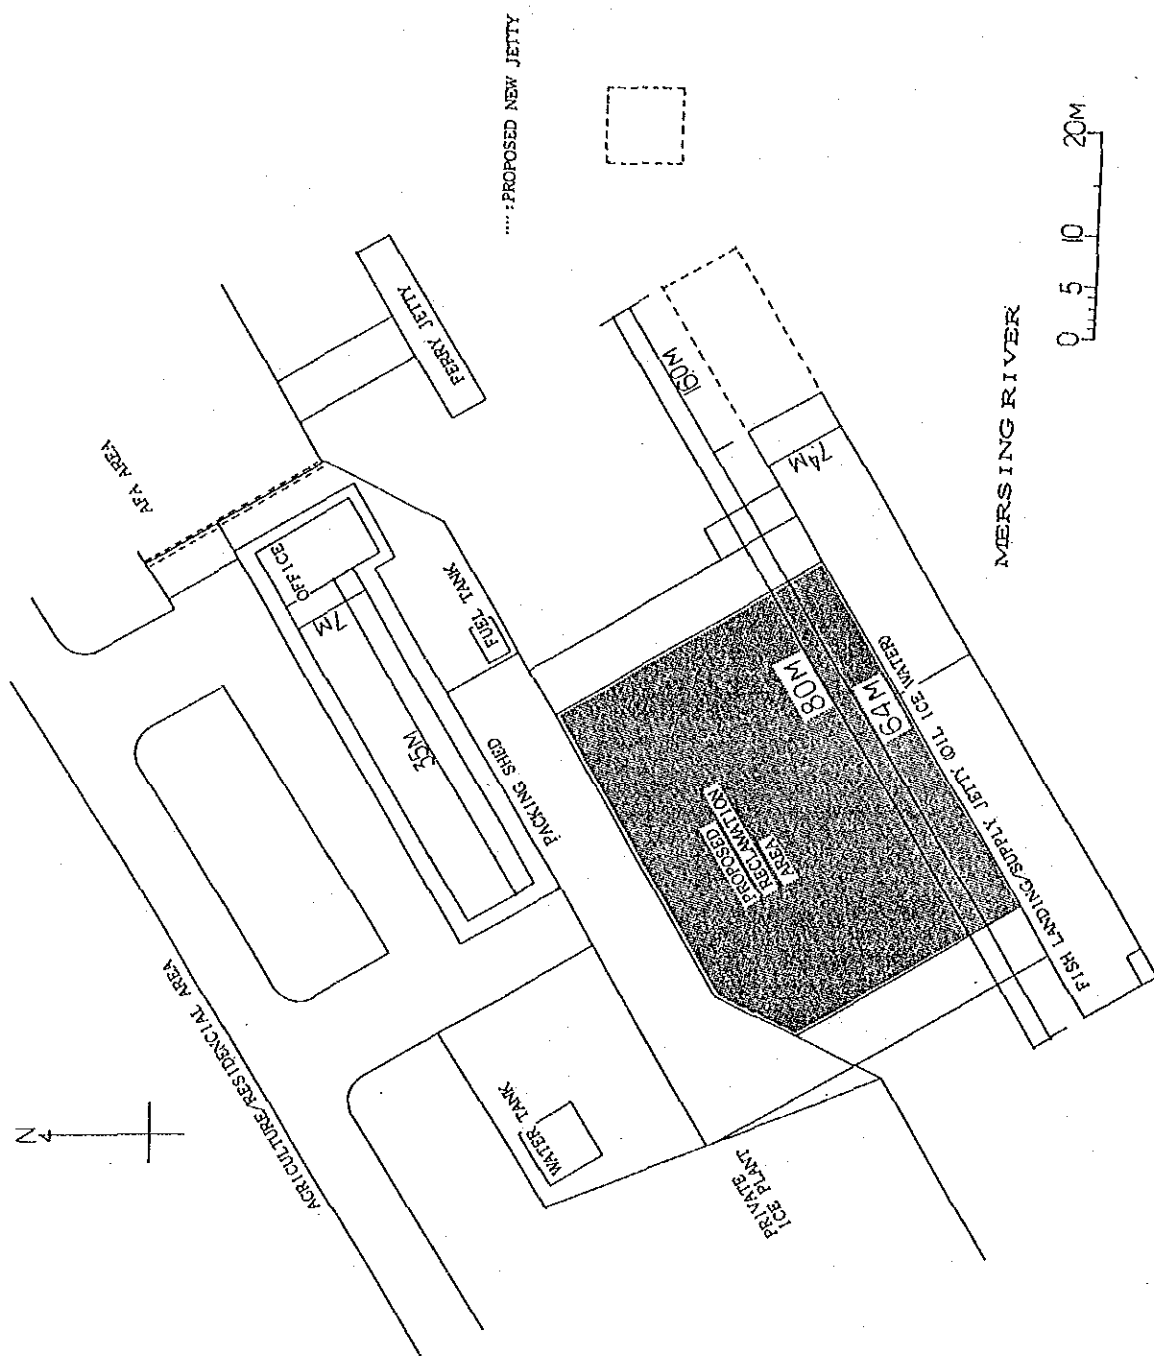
General Layout Plan of LKIM Complex of Mersing
